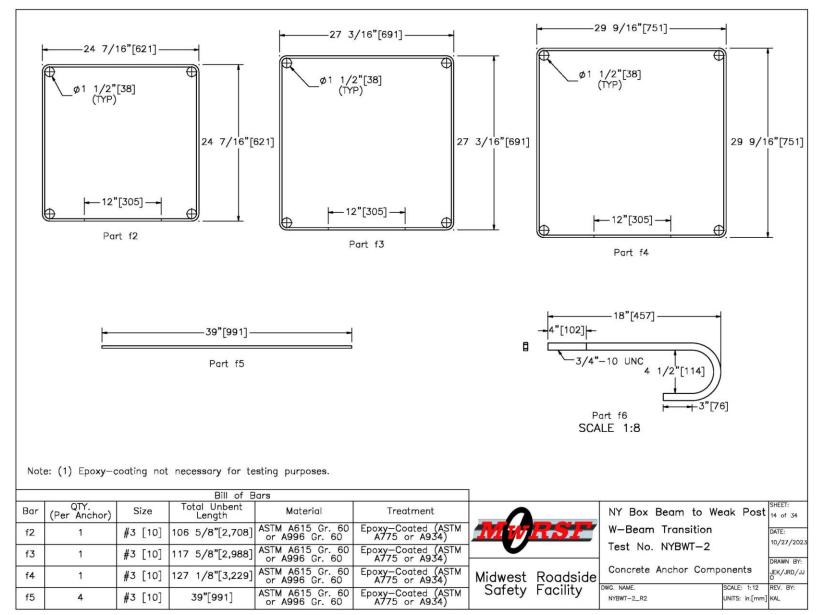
Concrete Anchor Components, Test No. NYBWT-2
